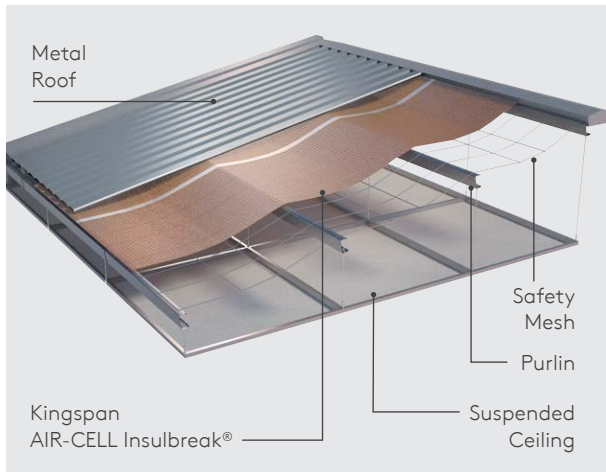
Kingspan AIR-CELL Insulbreak® in a commercial office with suspended ceiling installation.
